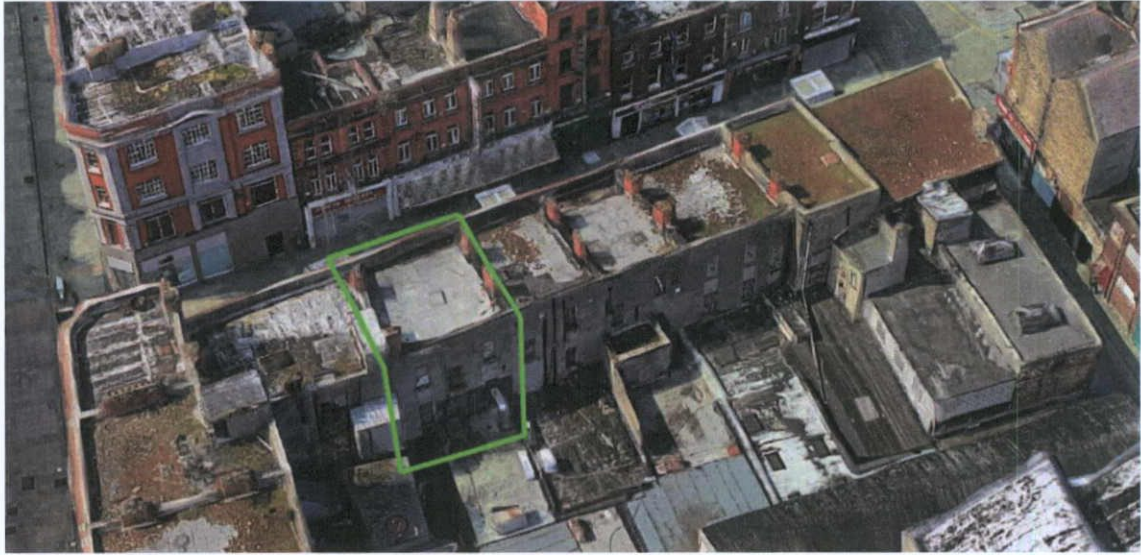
GoogleMaps view showing the flat roof and rendered rear elevation of the building.
